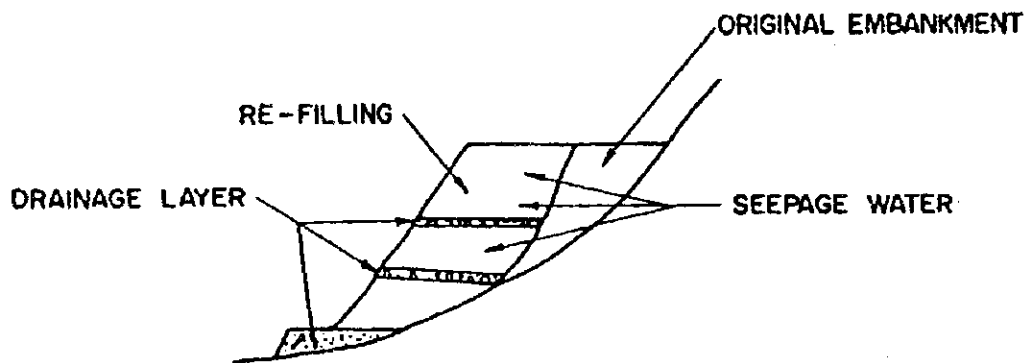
Berm Drainage Layer for Refilling a Fill Slope
